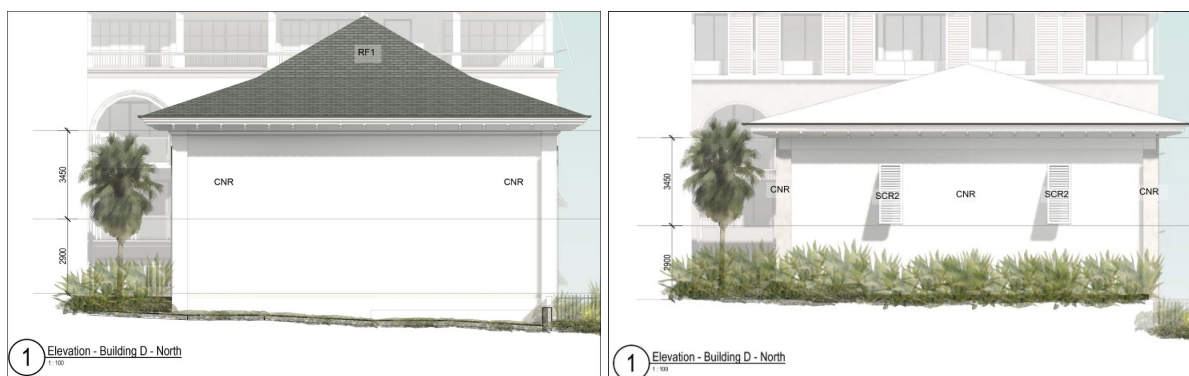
North elevation of Building D - Previous plans (left) and current plans (right)
